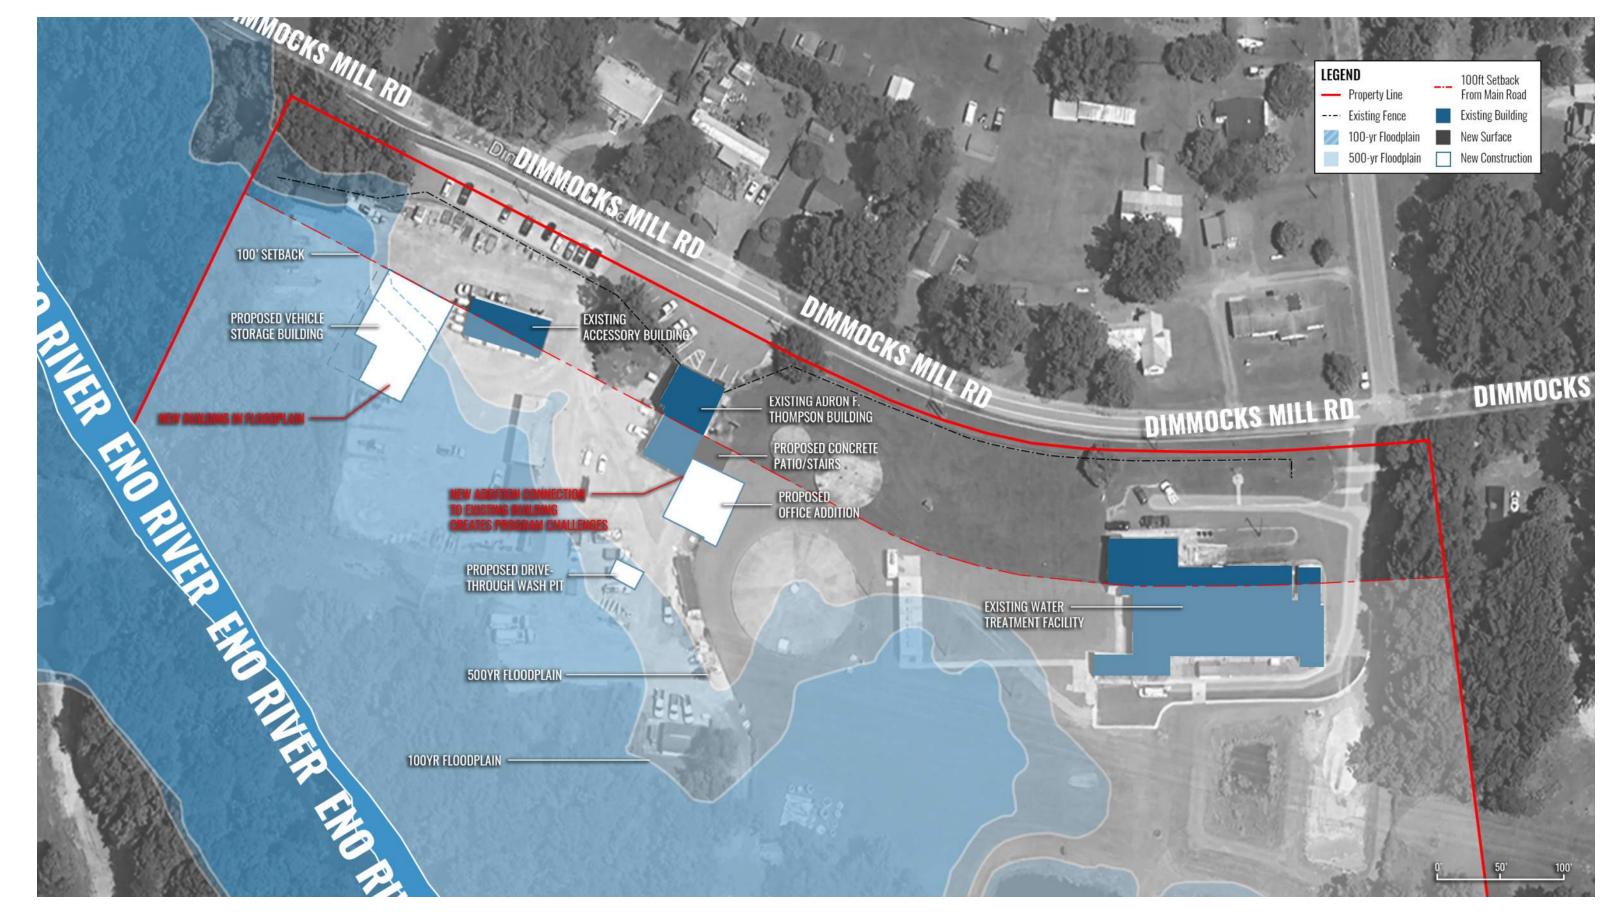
EXHIBIT D - New Building Locations Respecting 100' Setback Hillsborough Adron F. Thompson Facility - 2231.01
